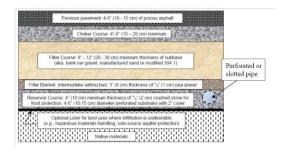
Typical Parking Area Cross Section for Porous Asphalt Courtesy: University of New Hampshire Stormwater Center
